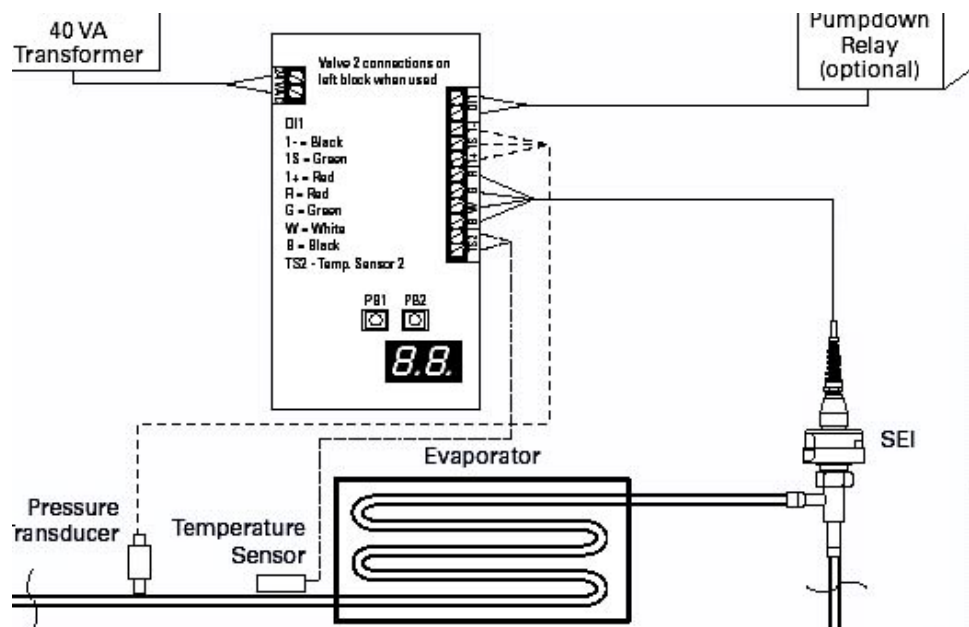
TYPICAL CONTROLLER WIRING SCHEMATIC
